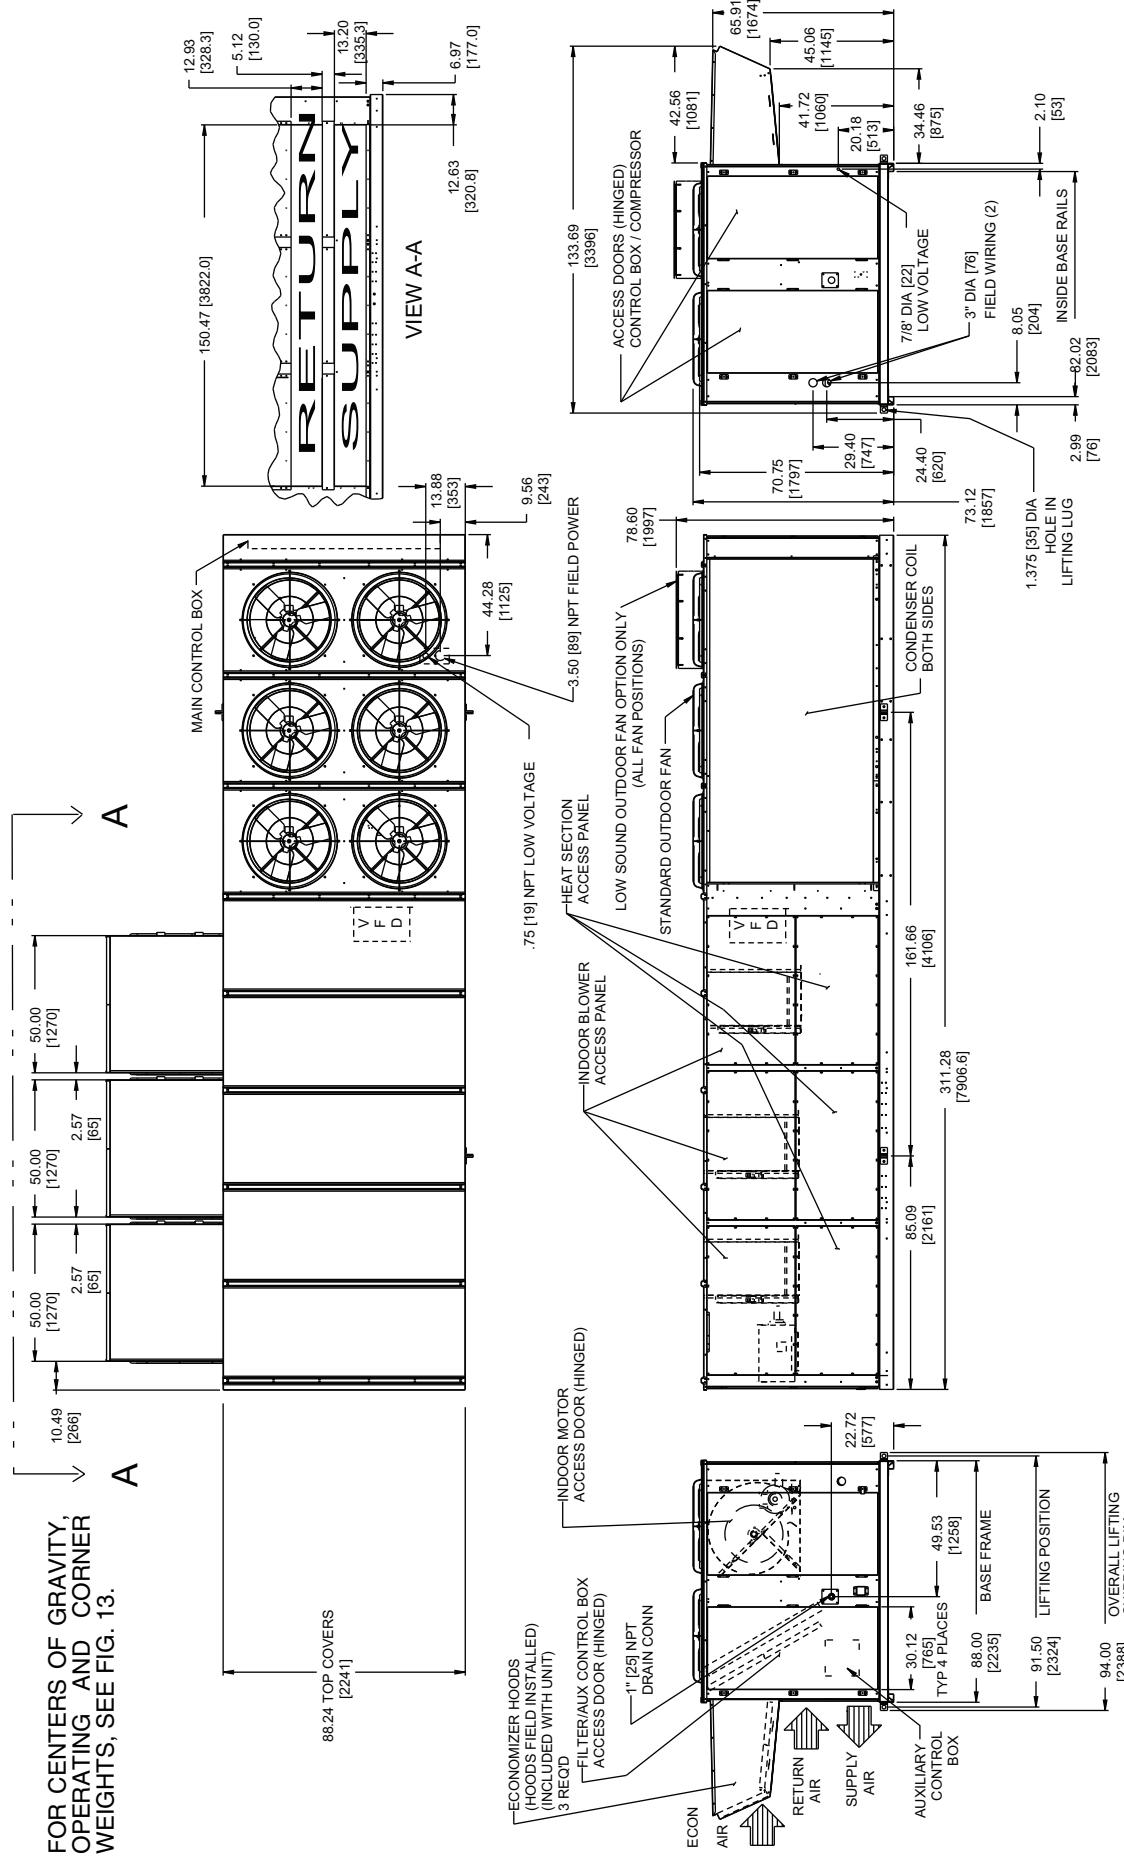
Base Unit Dimensions RTPF, Cu Tube Condenser Side Supply and Return — 48A4,A5060
